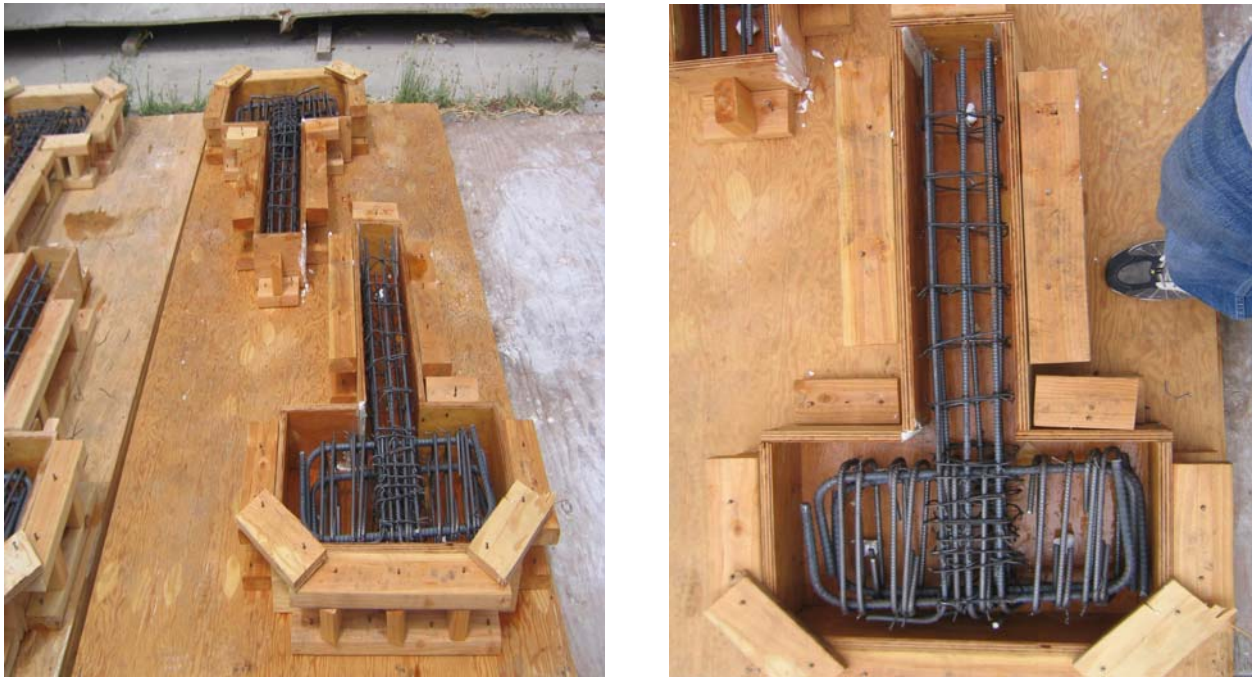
Forms and steel reinforcement cages of test specimens.
